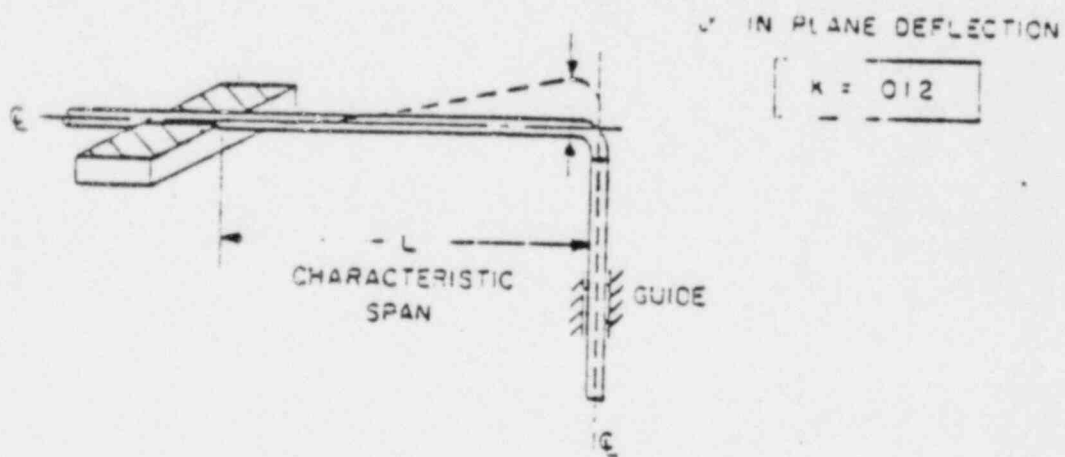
CANTILEVER SPAN-ELBOW-GUIDED SPAN IN PLANE DEFLECTION MEASUREMENT
